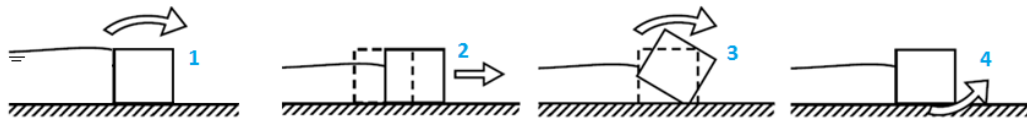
Typical structural failure mechanisms of temporary water retaining structures: Overflow (1), Sliding (2), Rotation (3) and Seepage (4) (Boon 2007)
